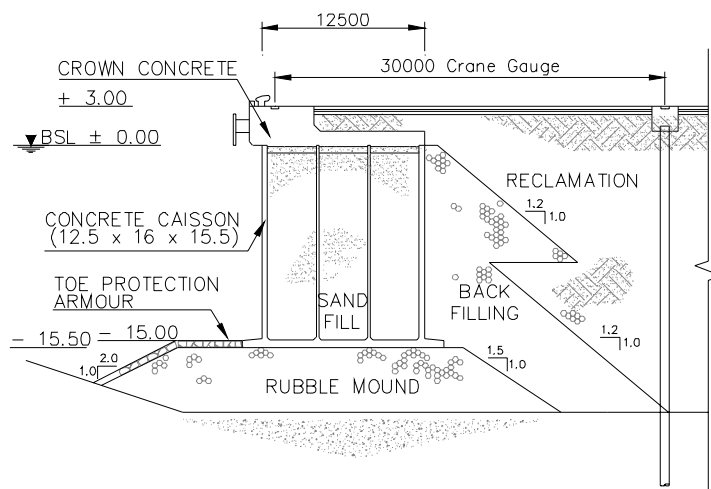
Cross-Section of Caisson-Type Structure (Berth No. 6)
